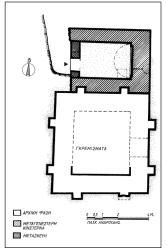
"Albanian tower". Plan (P. Androudis)
